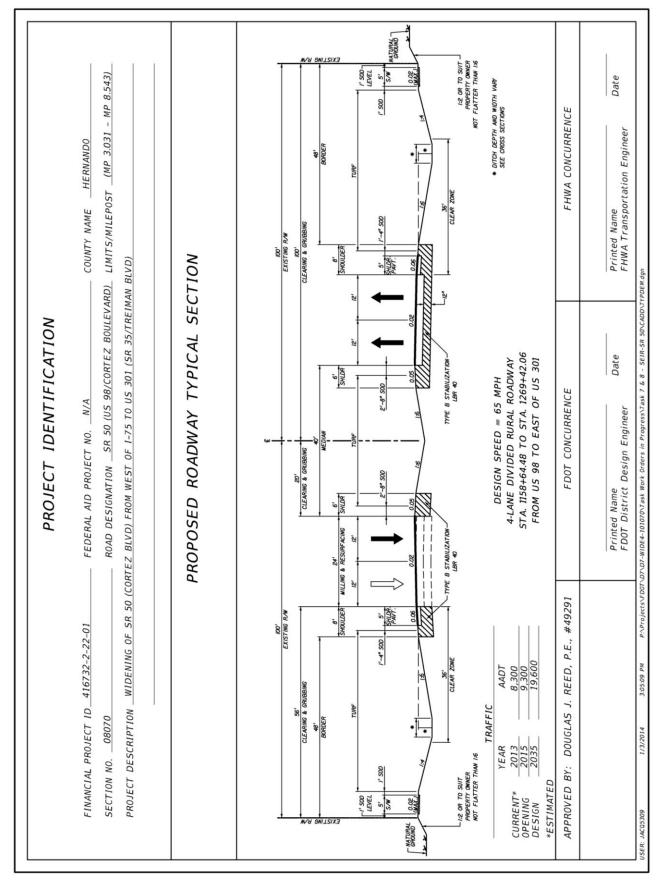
Proposed Roadway Typical Section STA. 1158+64.48 TO STA. 1261+68.43
